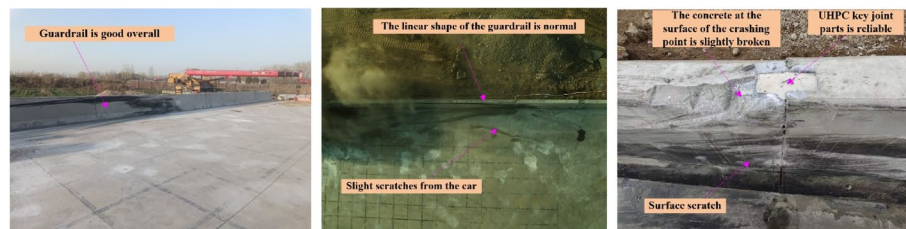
Damage on segmented prefabricated guardrails
